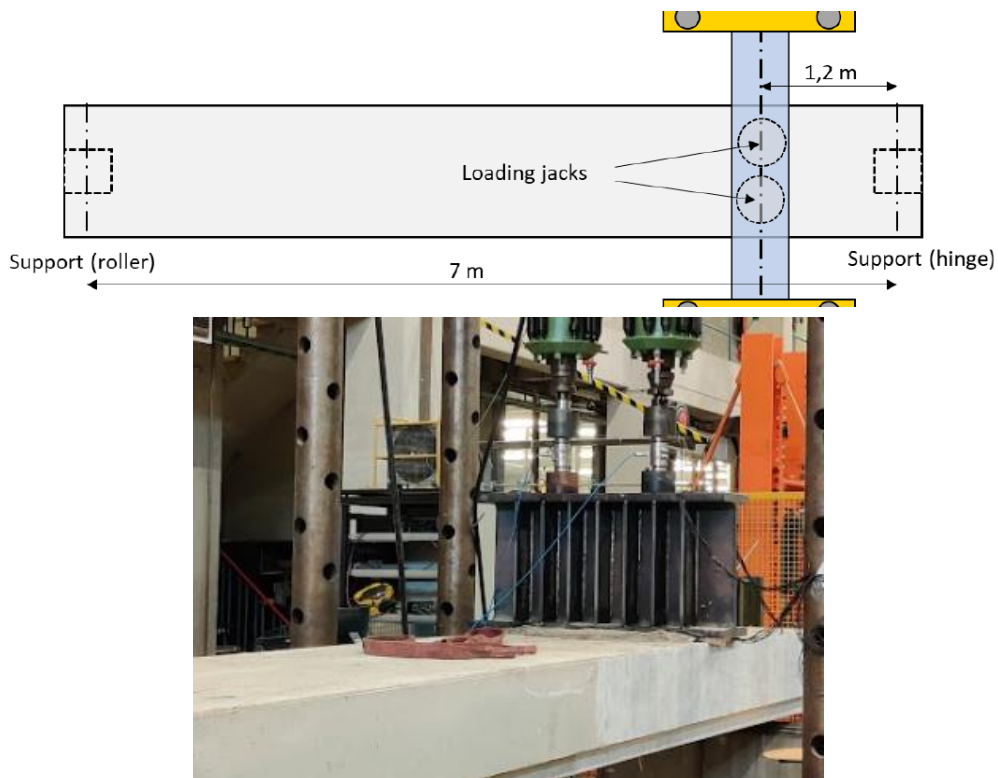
Top: Schematic top view of the single girder shear test setup. (Matthys, Proia, Sun, Ghorbani, & Krajnovic, 2022) Bottom: Photo of the side of the shear test setup
